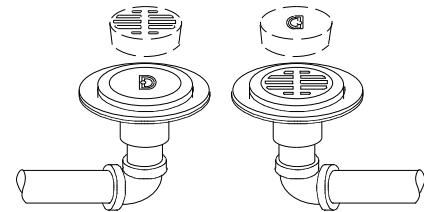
DECONTAMINATION FLOOR DRAINS
